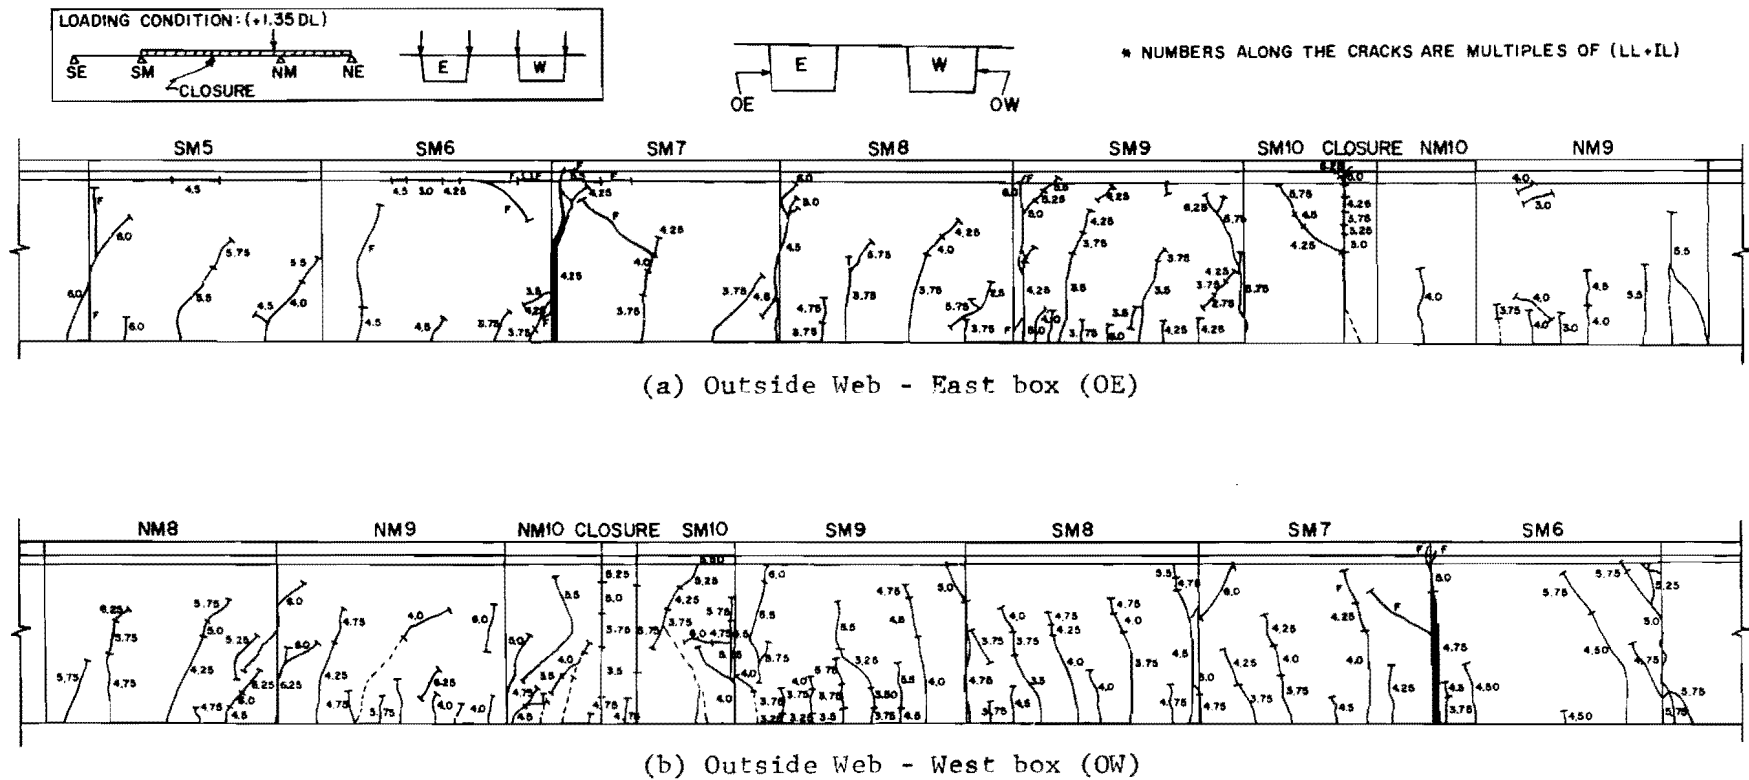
Development of cracks around the center of main span during loading to failure.
